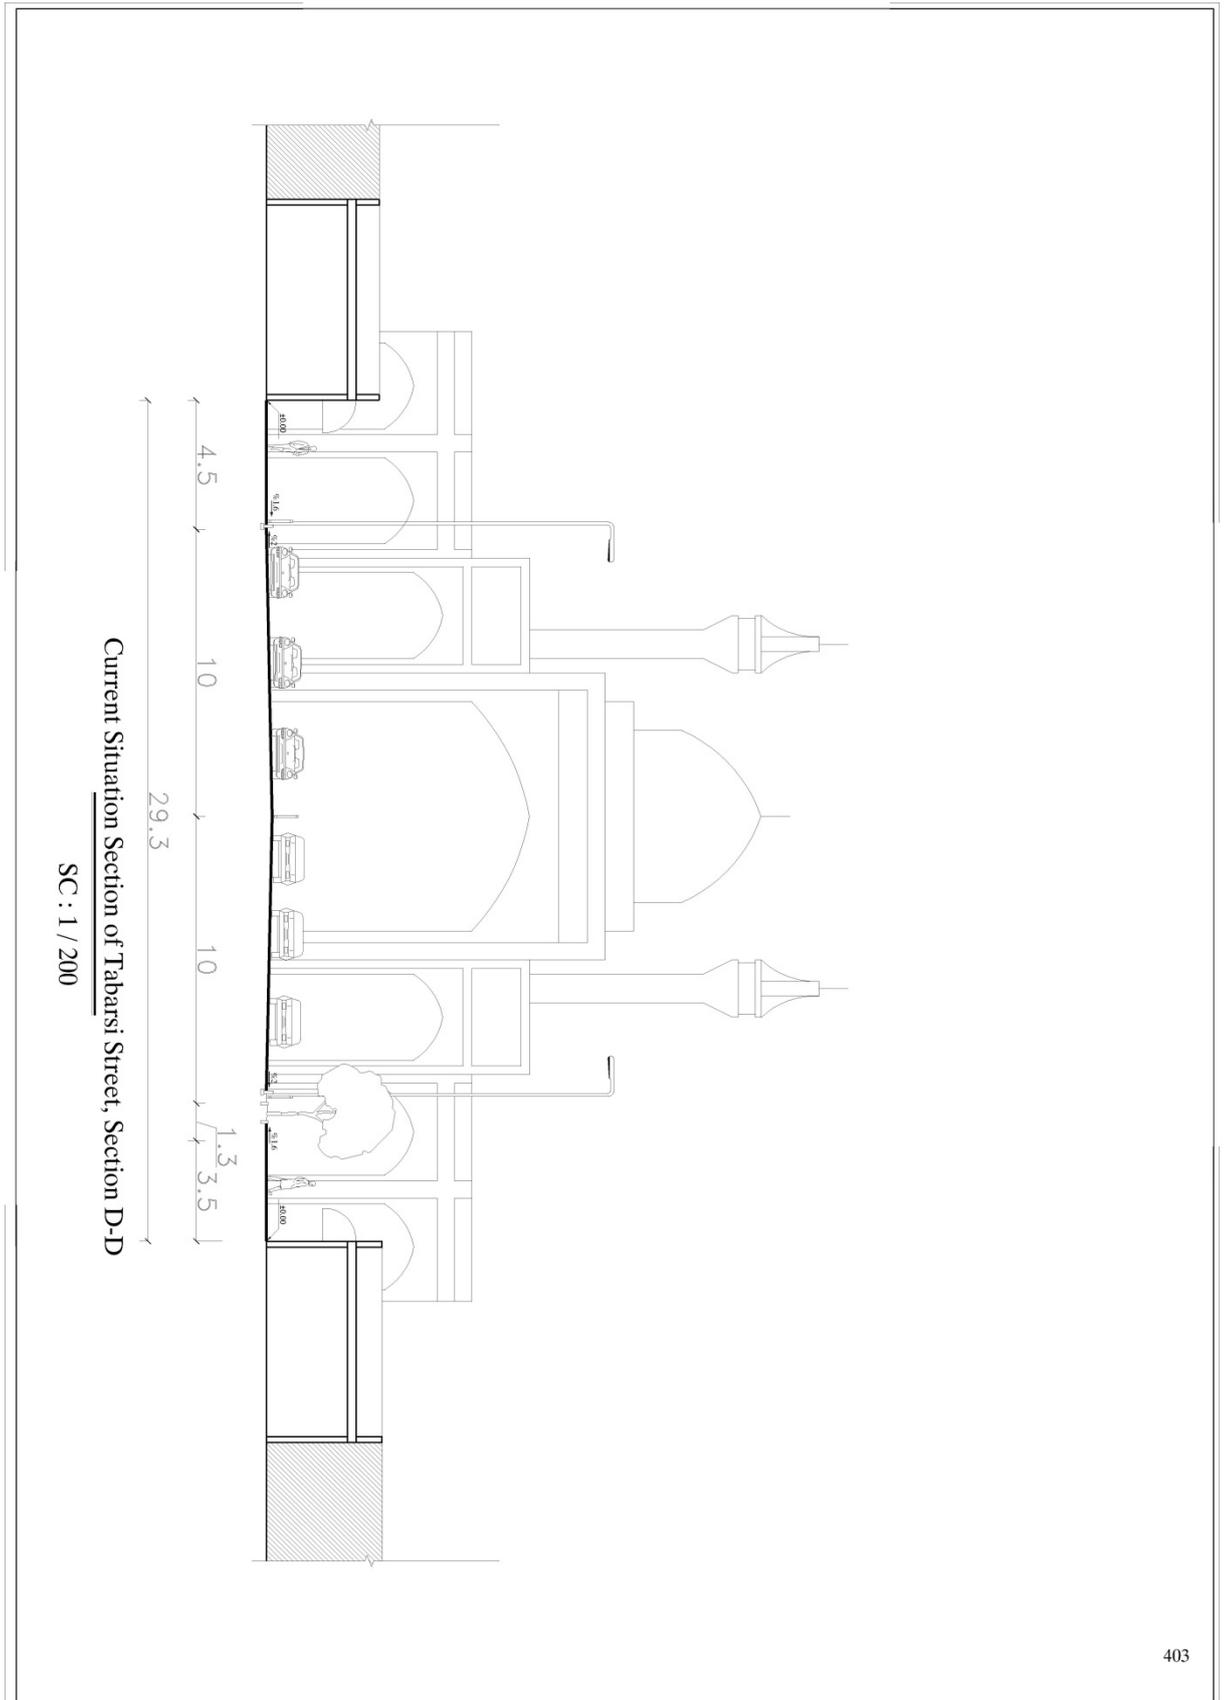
Section of Tabarsi Street, Section D-D. (Author)
